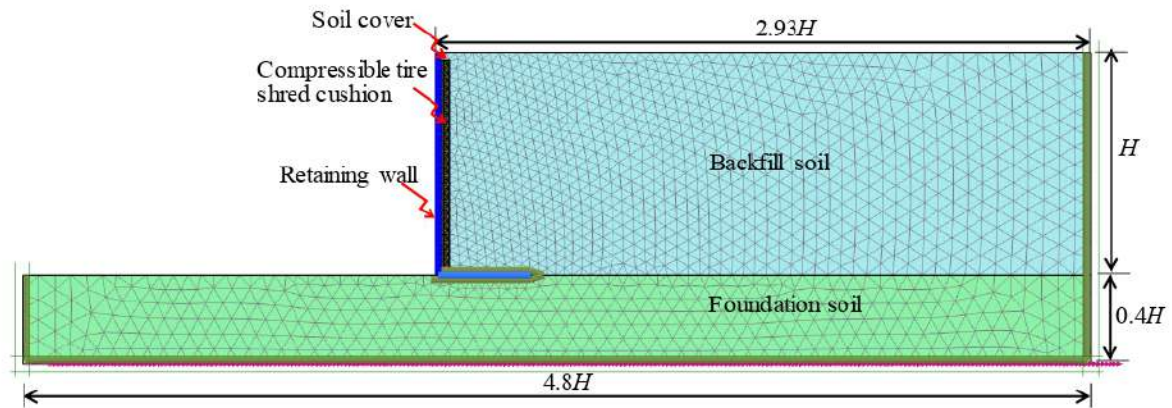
2. Finite element model of a cantilever retaining wall with CTS cushion between sandy backfill and retaining wall.
